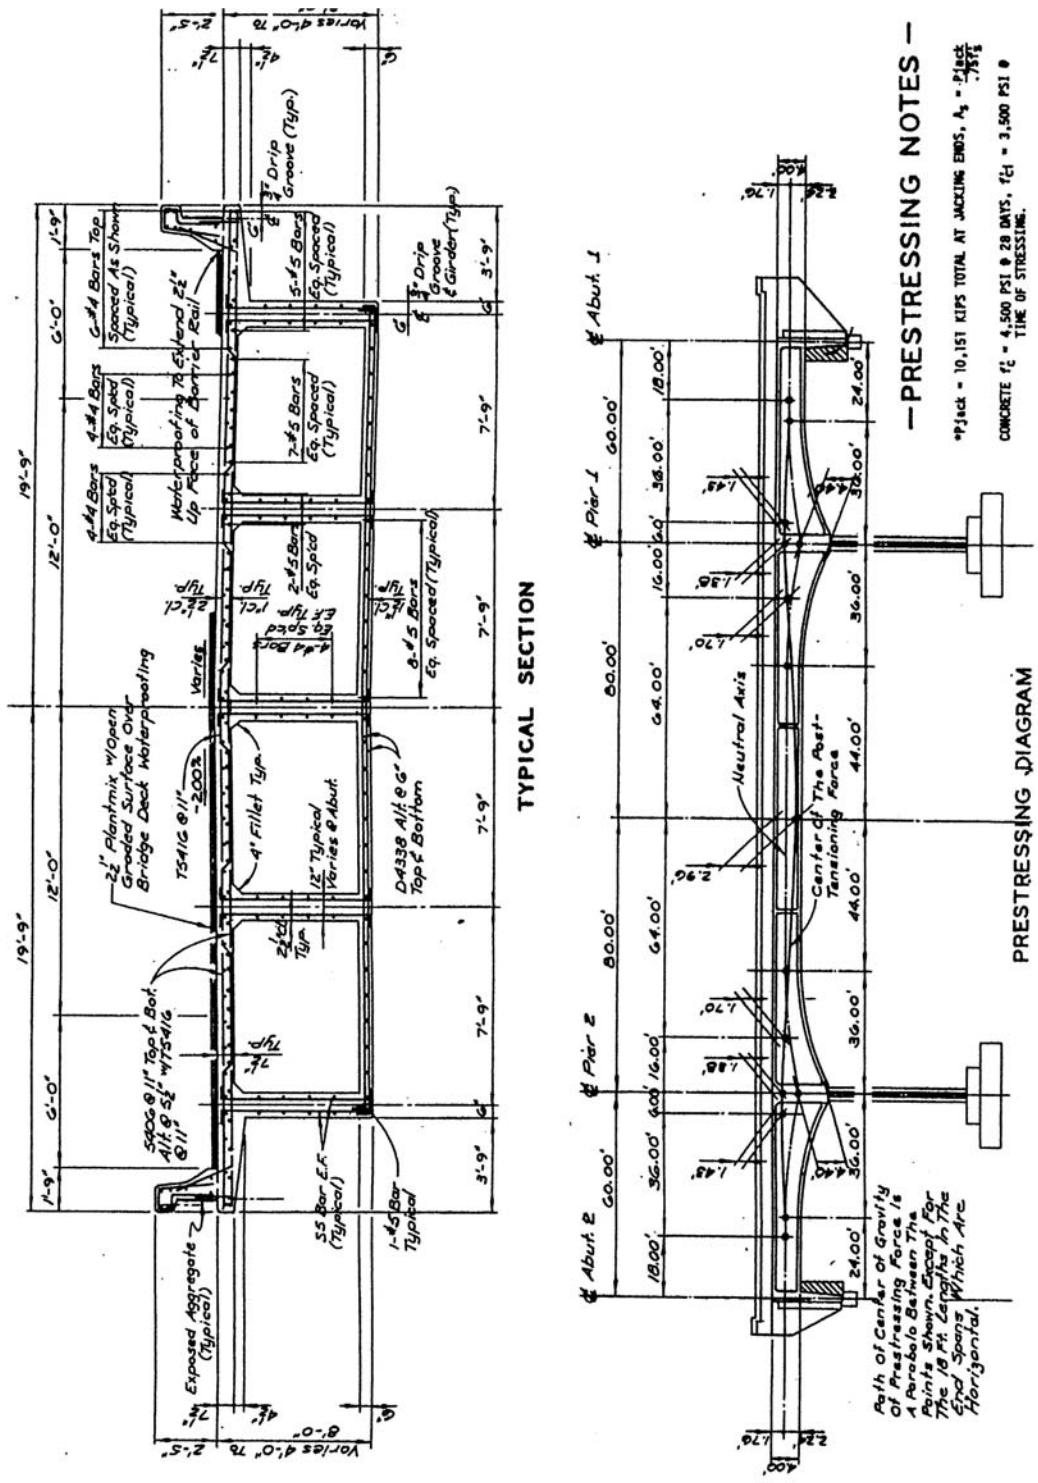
Bridge I873 Typical Section and Prestressing Diagram
